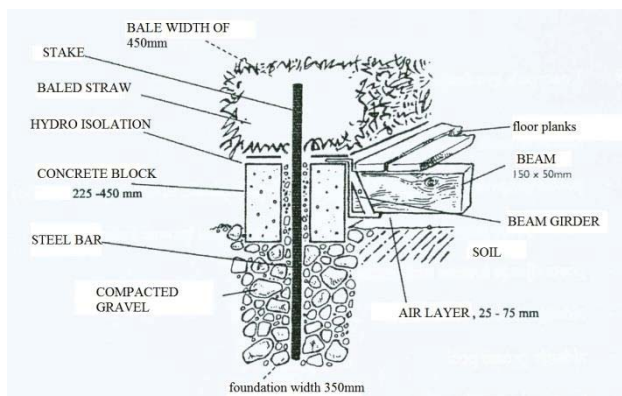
Detail of the foundation with concrete blocks and drainage [1]
